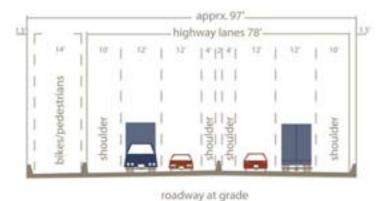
4-Lane Alternative Roadway Cross Section
